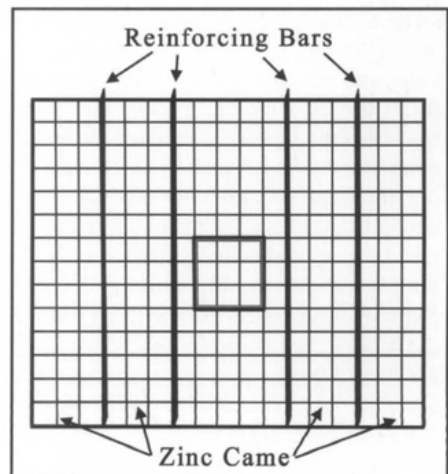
The four vertical reinforcing bars were soldered to the inside face of the transom panel. Drawing: Chad Randl.
